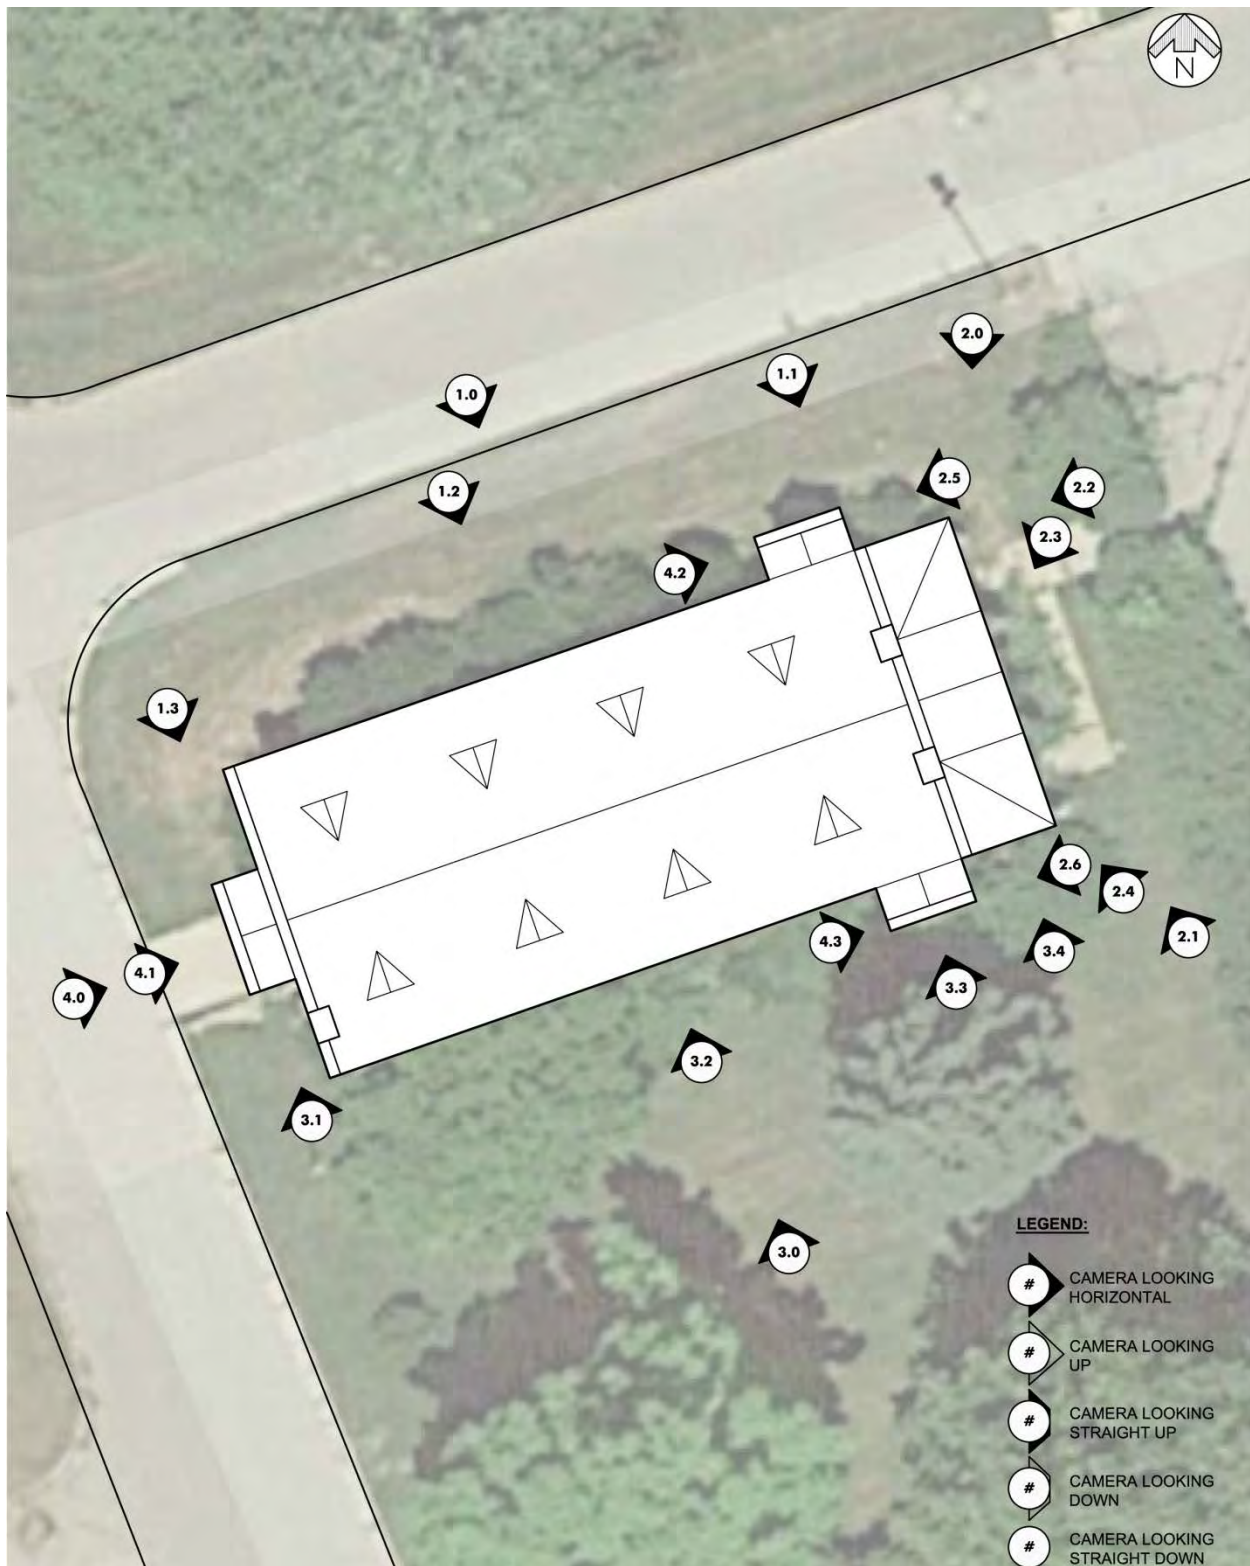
Photo No. 1.0 – 4.3 (Elevations)
